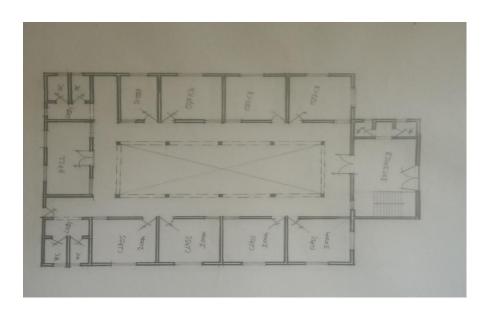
FLOOR PLAN OF CASE STUDY TWO
